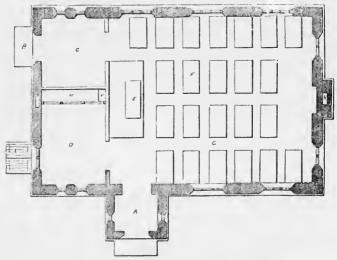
Ground Plan, adapted to Design No. 11, Fig. 73.
